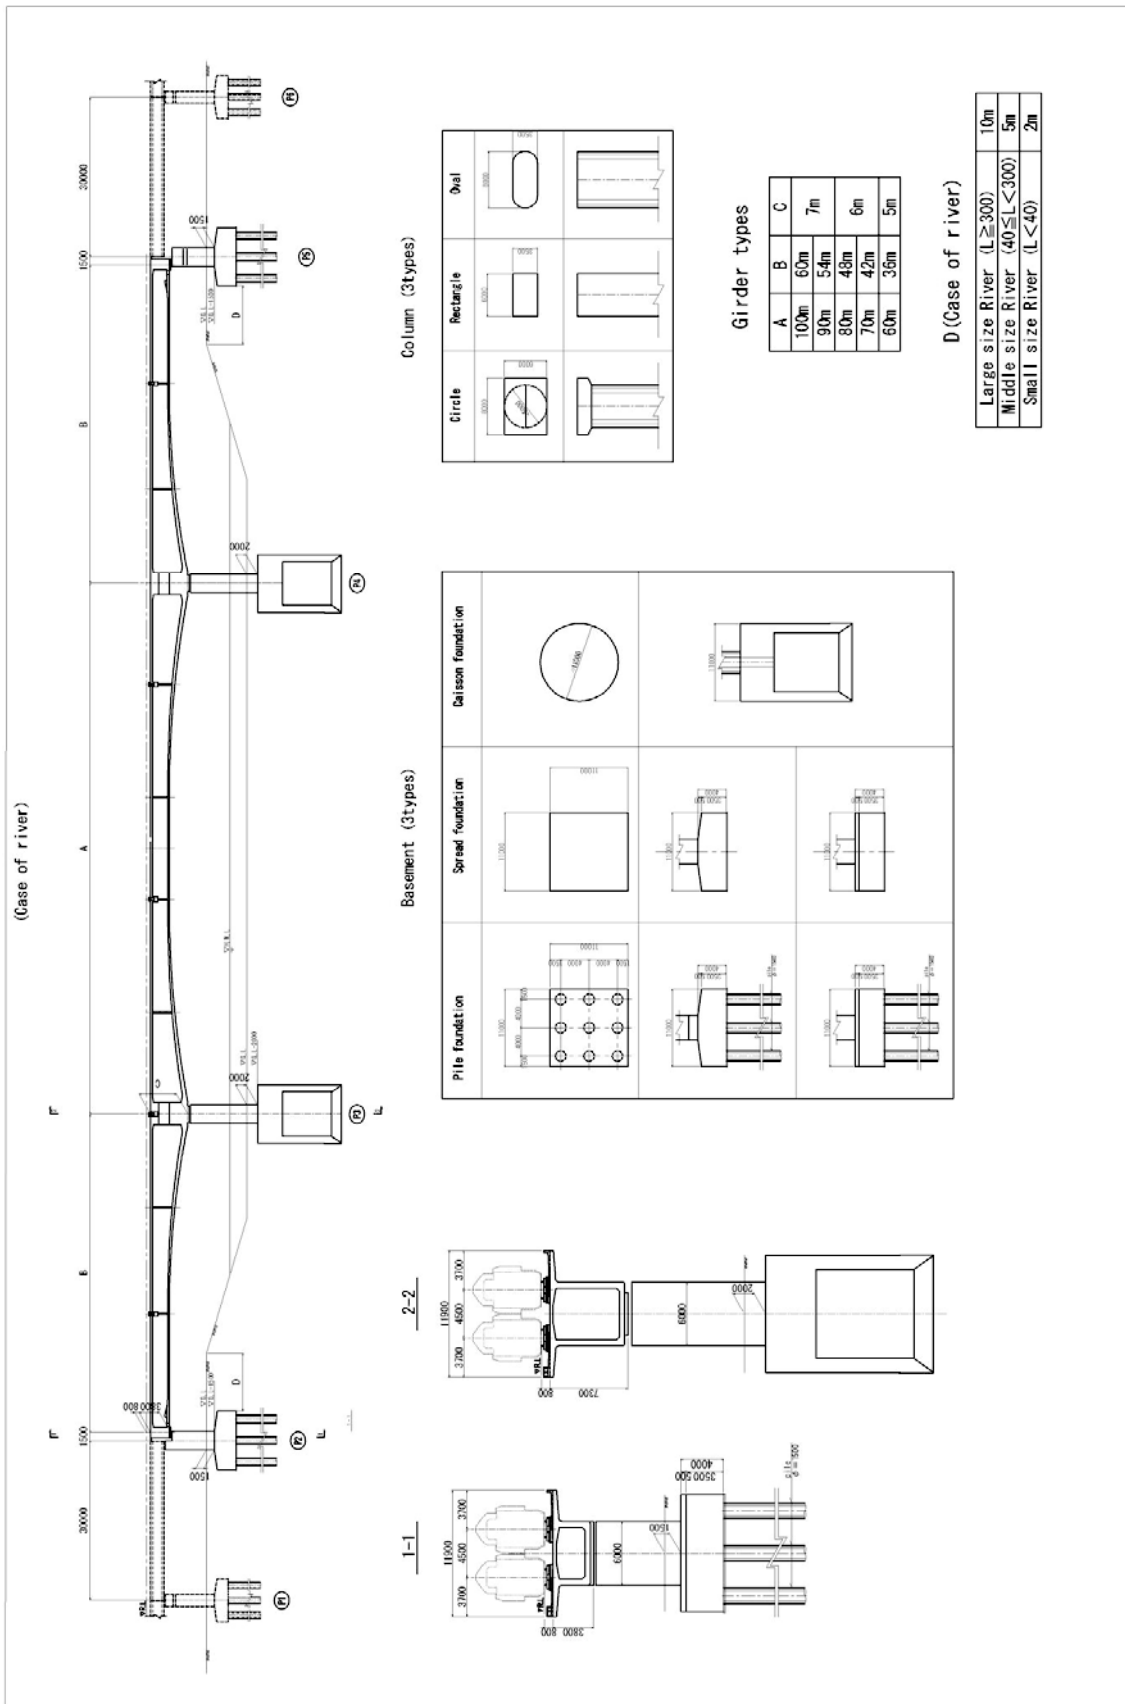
Drawing of Standard Structure Type for Bridge, Cantilever erection method
